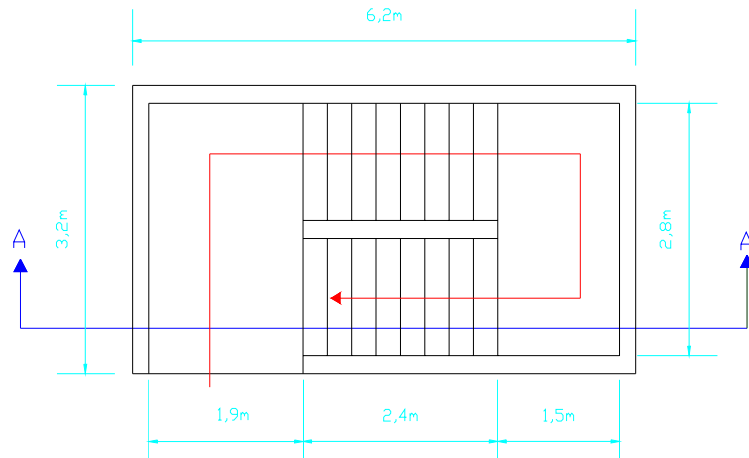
Horizontal of an Emergency Stair Dimensions
